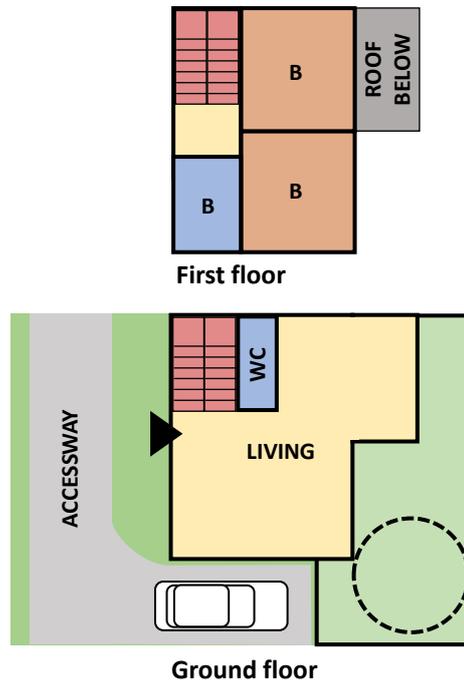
Example of a double-storey, two-bedroom dwelling without a garage.
